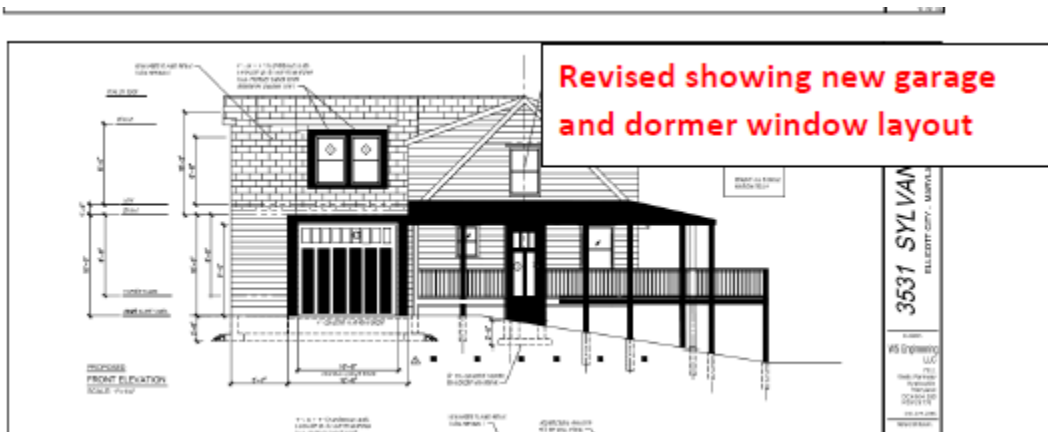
Current submission incorrectly shows roofing shingles instead of siding.
